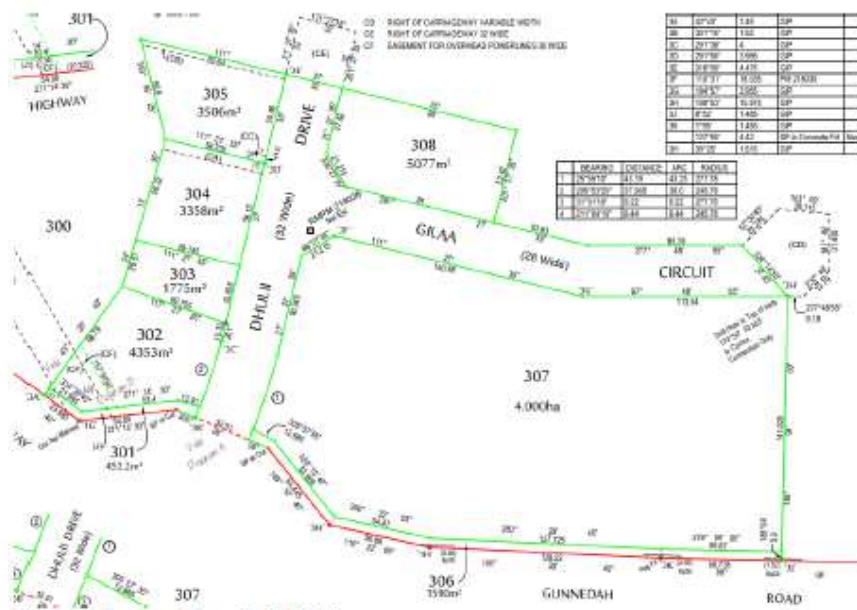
Copy of stamped subdivision layout plan from DA2022-0029 / MOD2024-0118.
